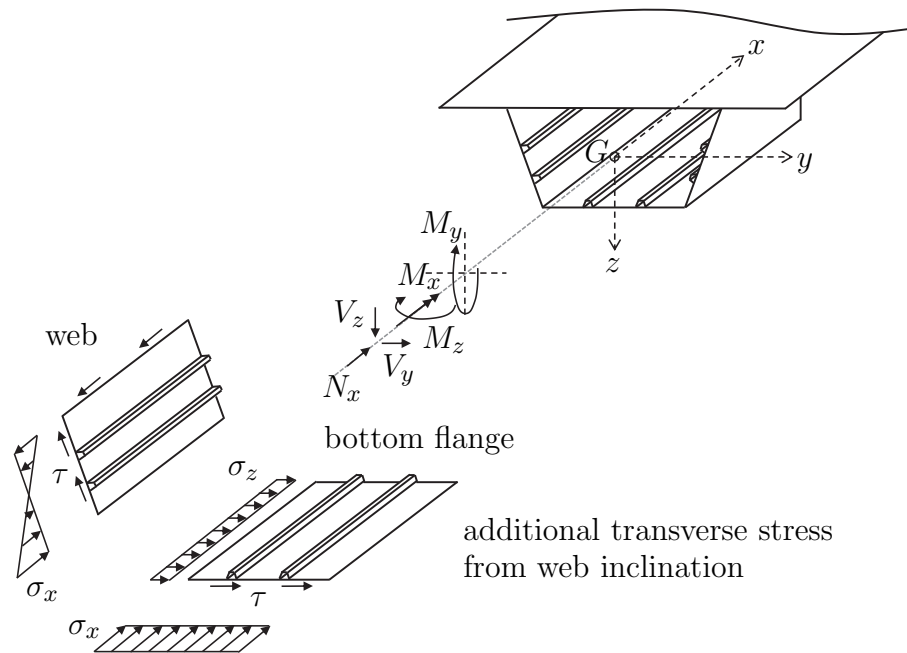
Loading of plates on a box-girder cross-section, based on [46].
